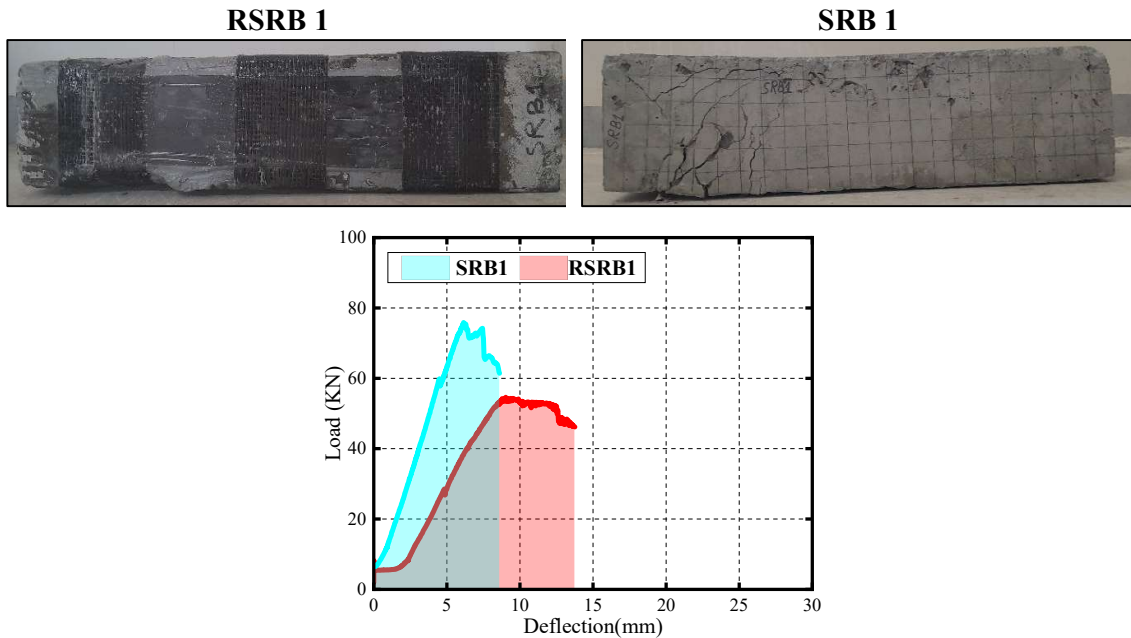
Comparison between Retrofitted Steel Reinforced Beam and Steel Reinforced Beam (RSRB 1 vs SRB 1)
